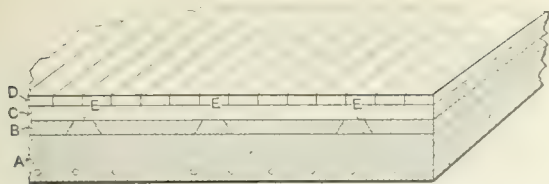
Method of Attaching Wooden Top Floor to Concrete Slabs.
